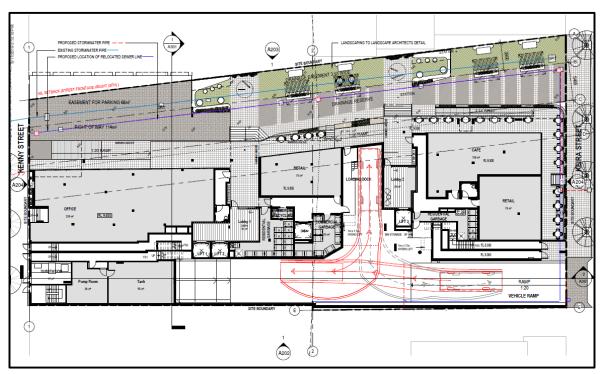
Proposed Site and Ground Floor Plan (*Source: Brewster Murray)
